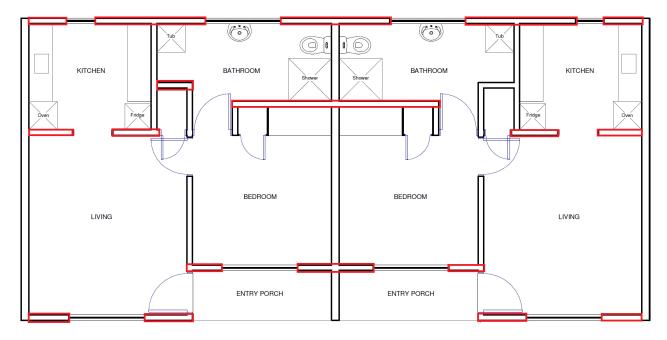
Walls used for bracing in the longitudinal direction. (Units 26-35)
